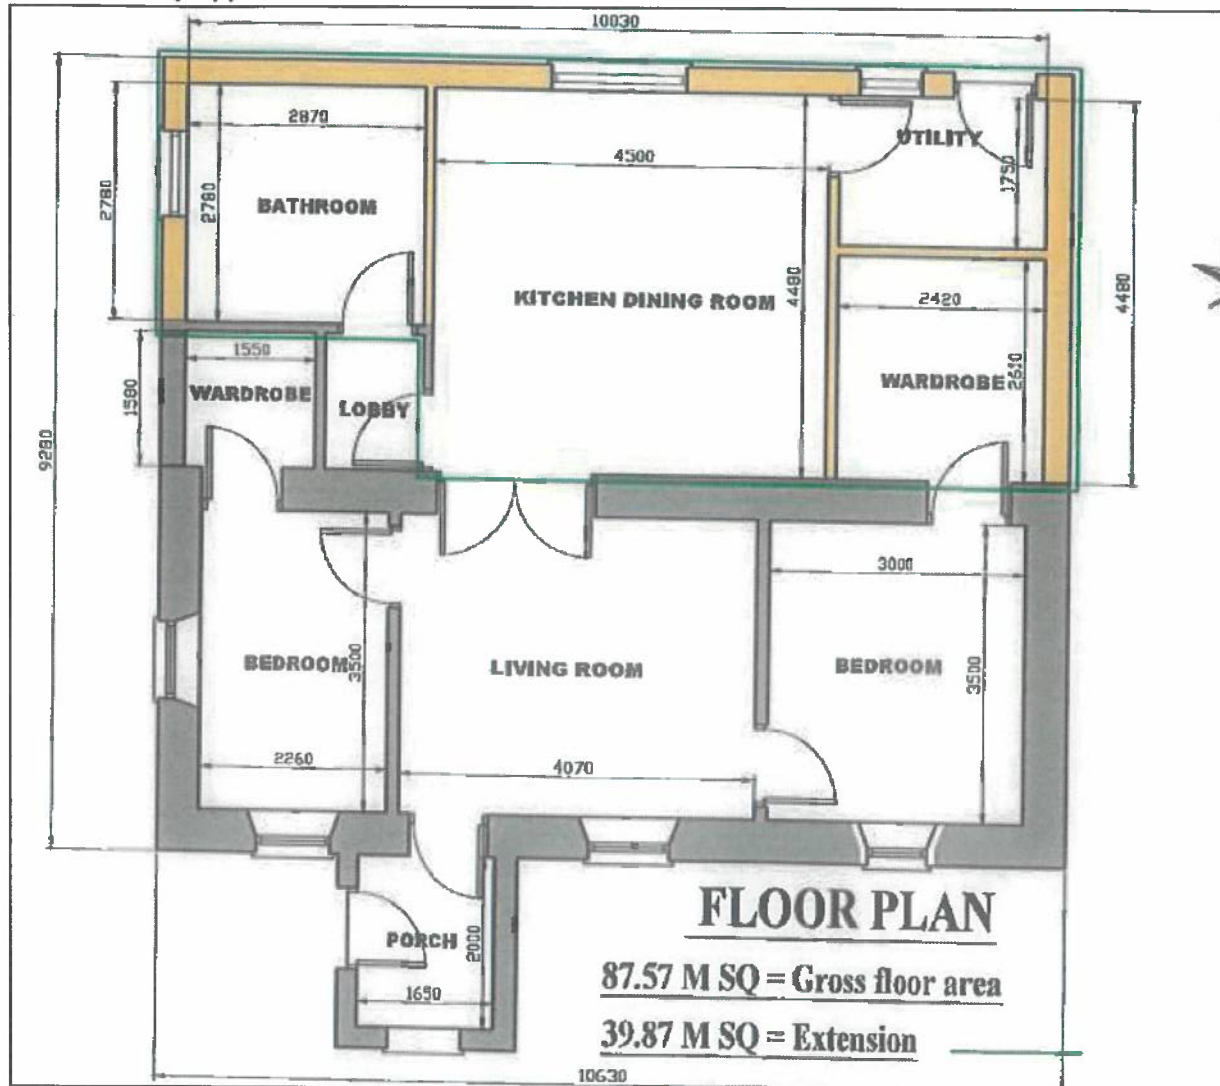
Existing floor plan - note total gross floor area of extension is 39.87m<sup>2</sup>.
